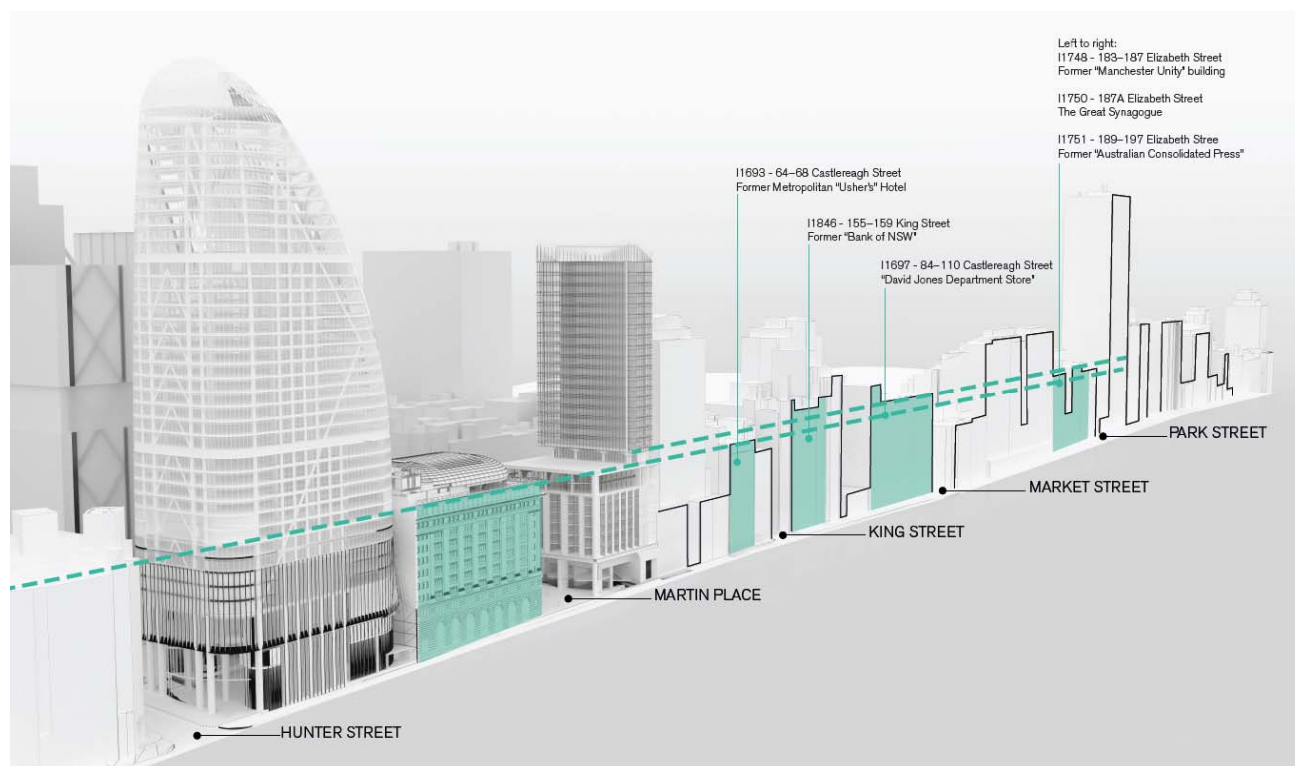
Potential for a continuous street wall, as viewed from Castlereagh Street
